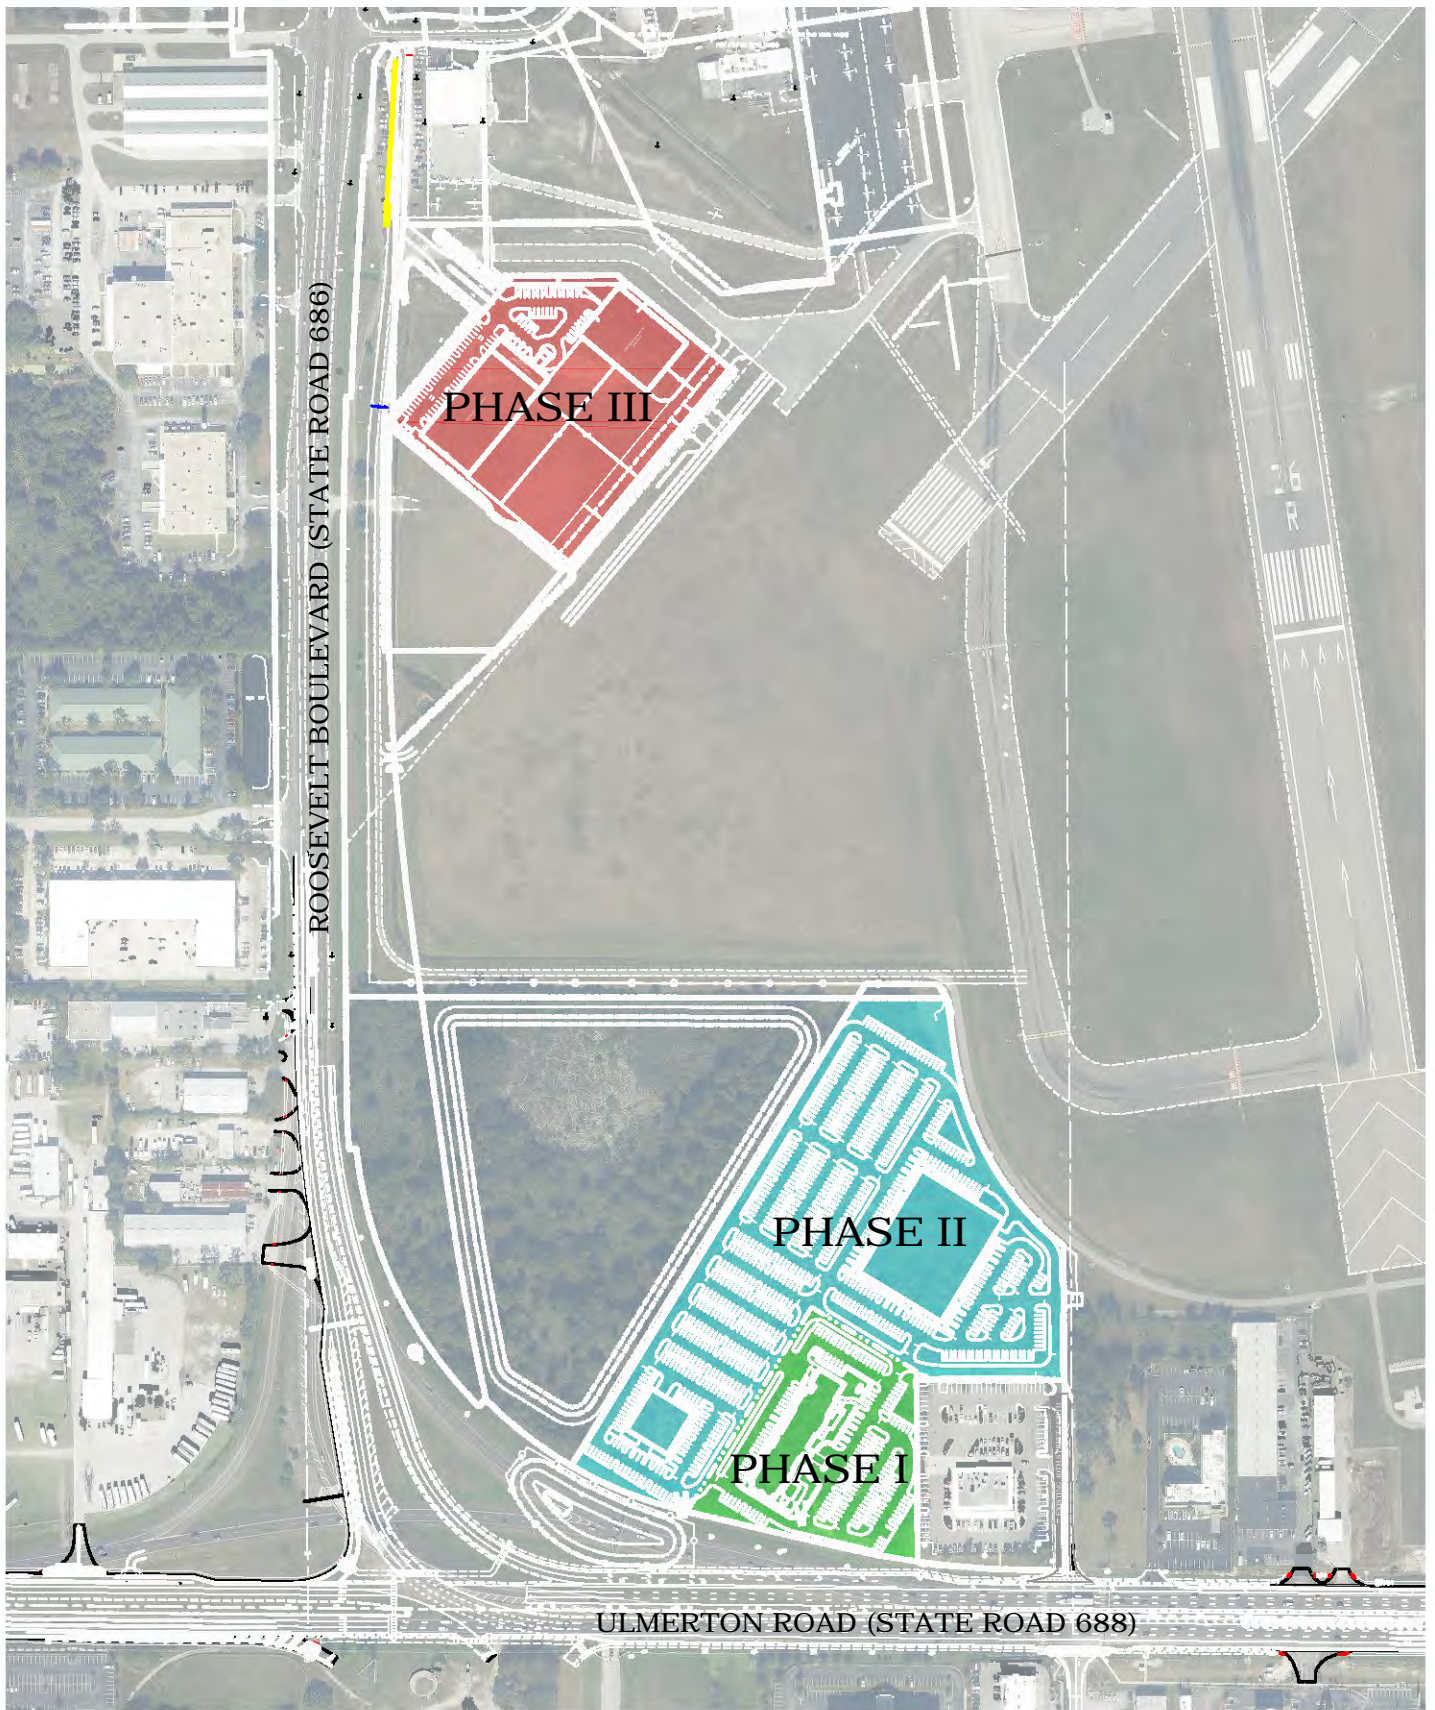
SITE PLAN BROOKLINE PIE ULMERTON, LLC
